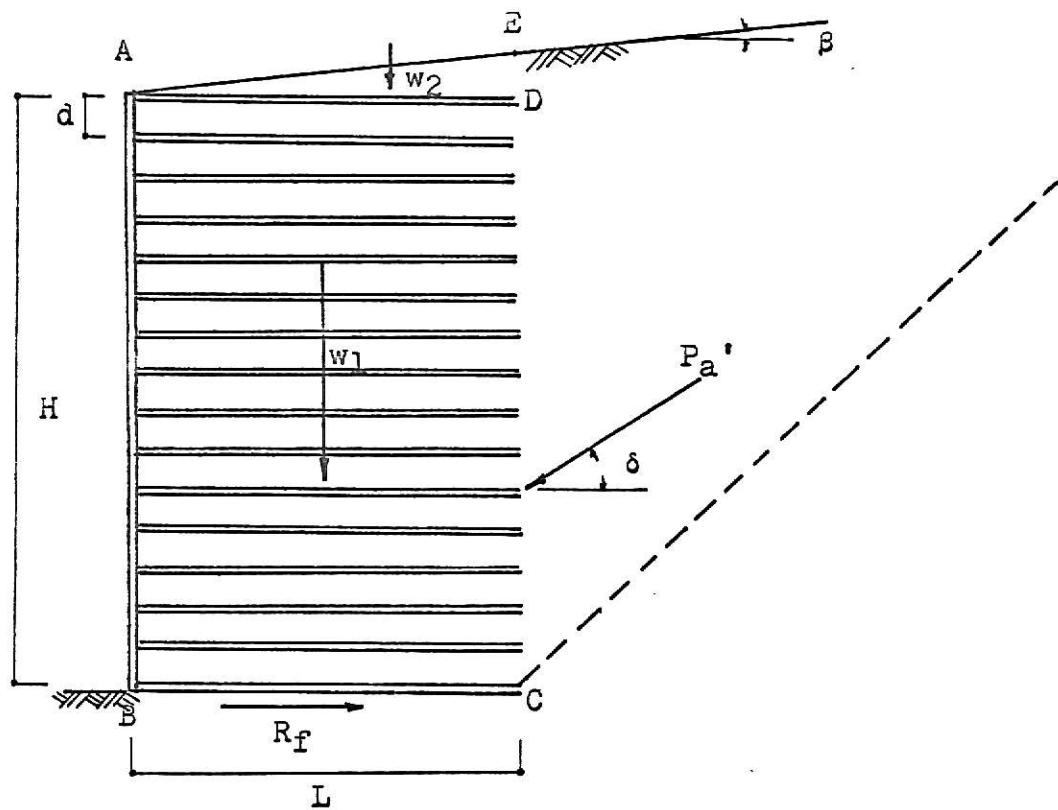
Forces acting on a strap reinforced earth retaining wall
